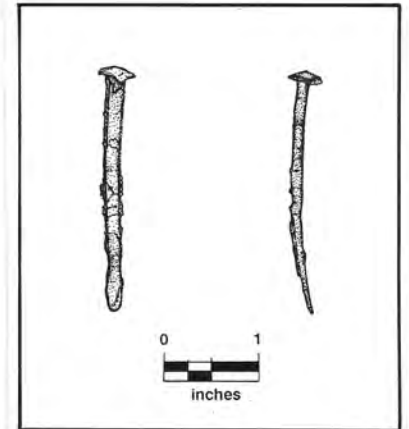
Matthew Jones House, rosehead nail recovered from top of west joist and originally used to secure attic flooring.
